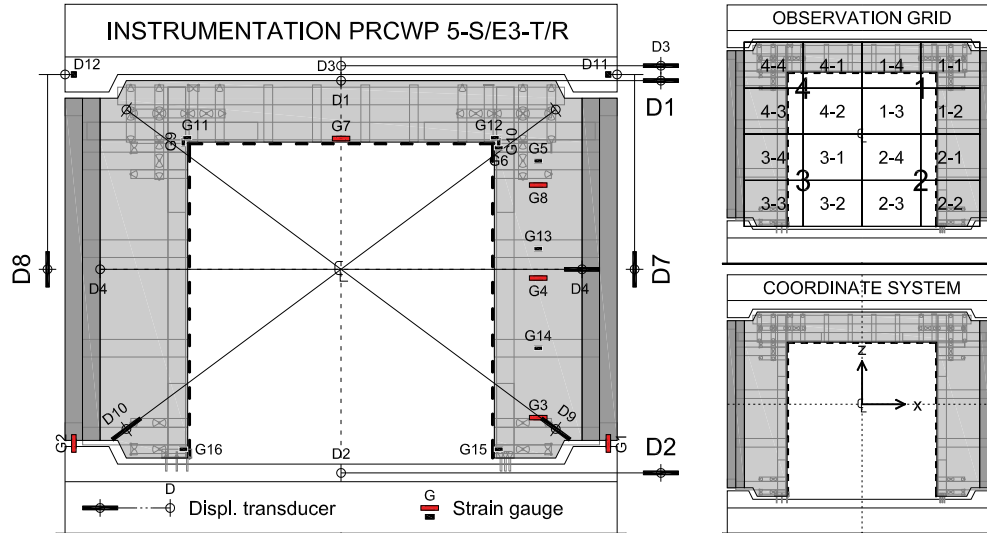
Instrumentation layout of specimen PRCWP 5-S/E3-T/R
